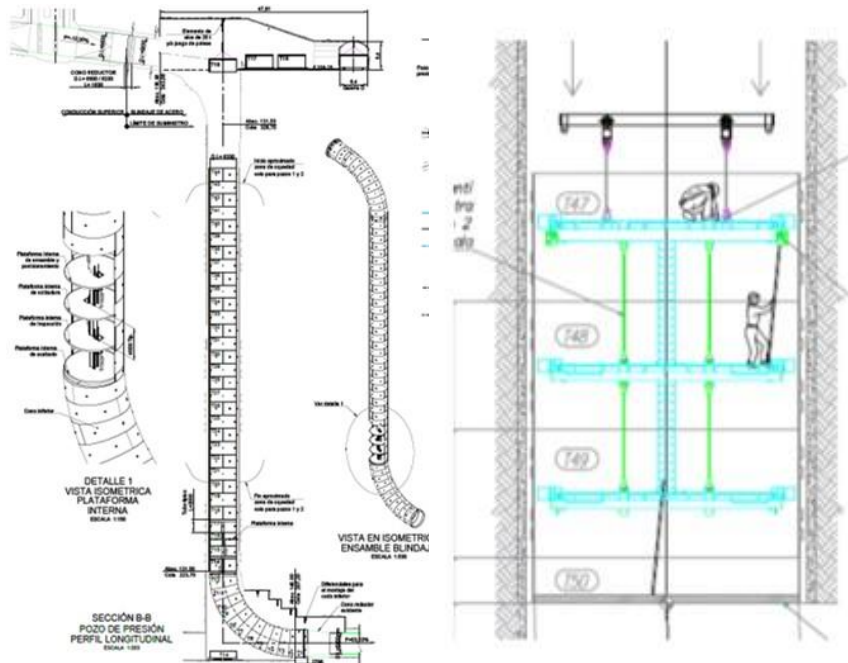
Penstocks installation method (Left) - Installation platform (Right)
